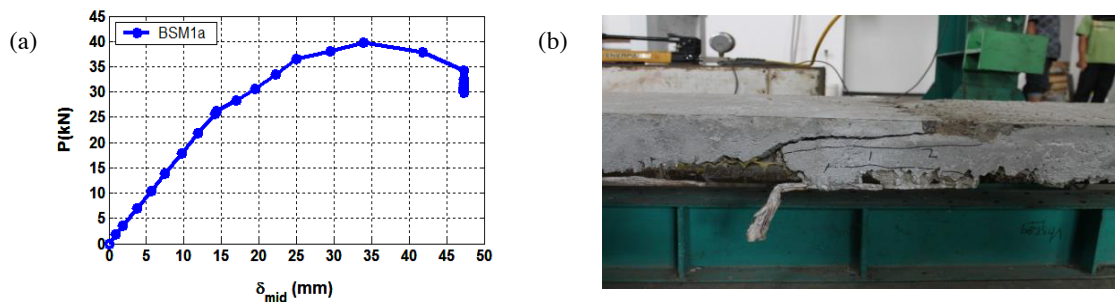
(a) Typical beam behaviour; (b) photograph of slab after testing showing cracks
